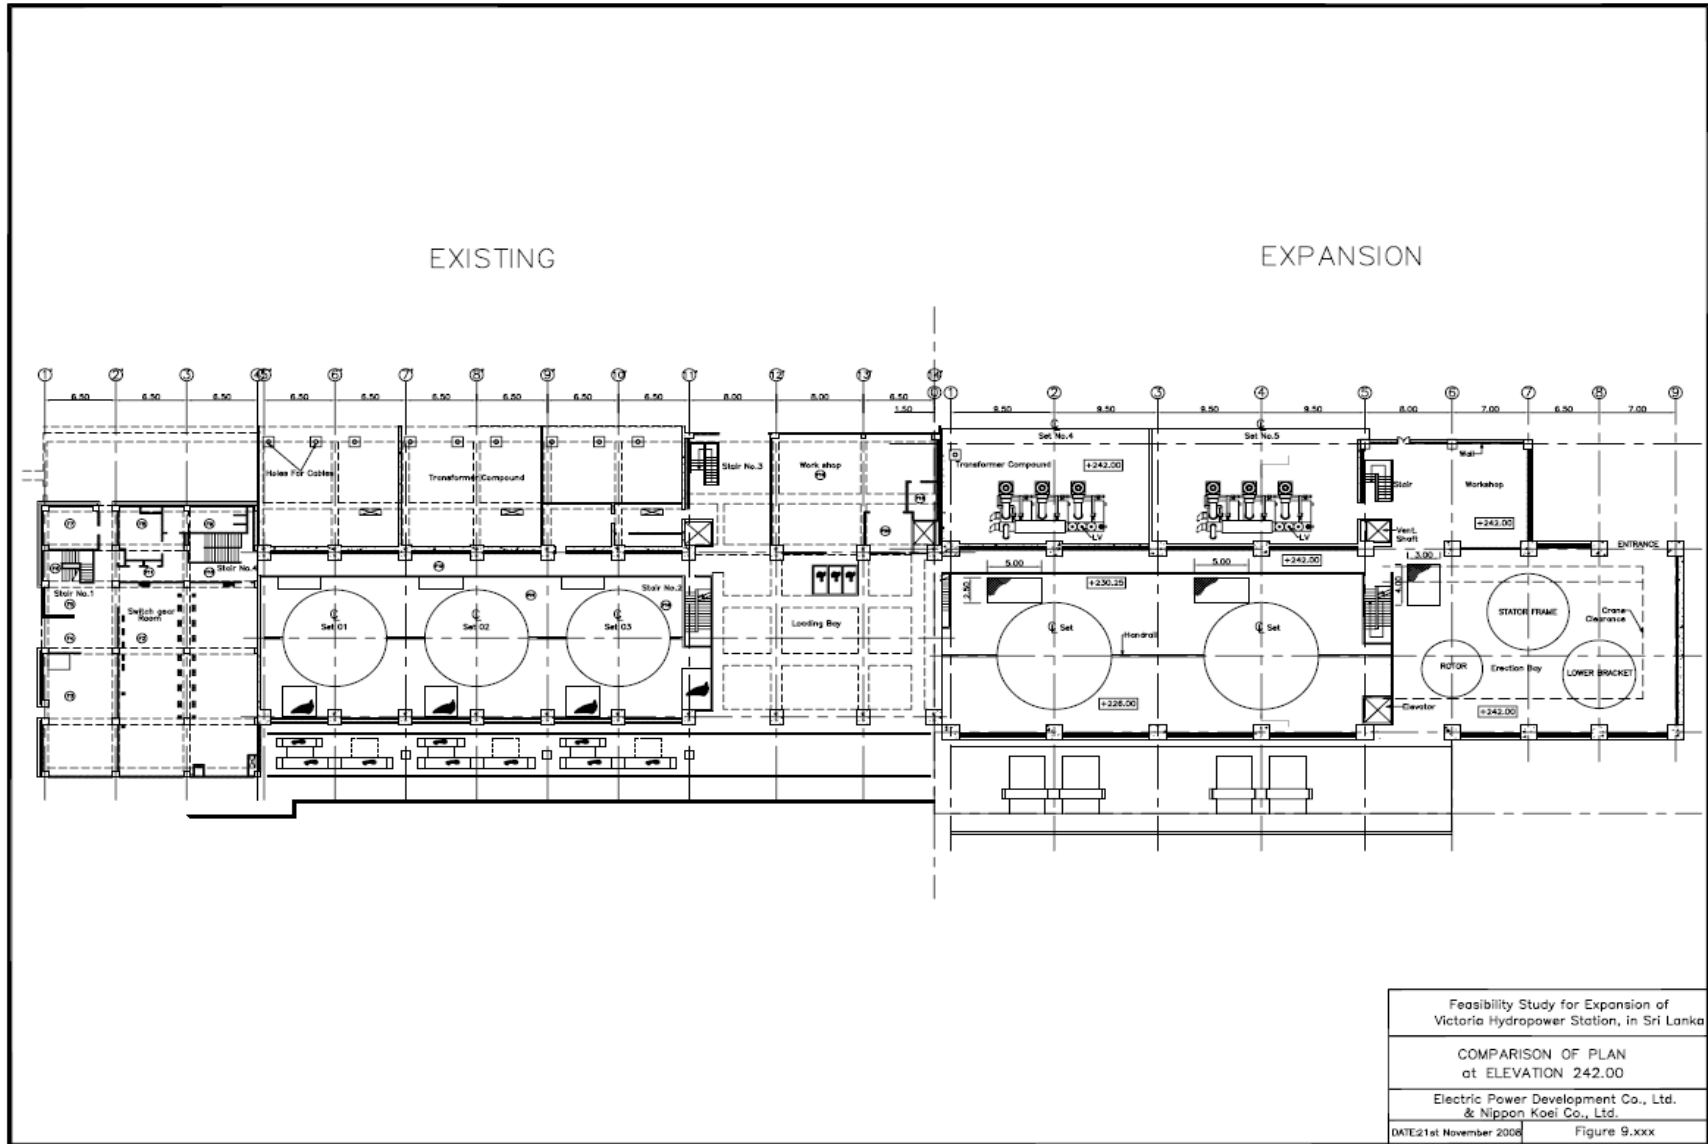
Plan of the Existing and Expansion Powerhouse
